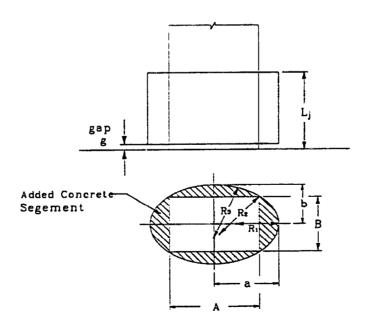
Confinement of Rectangular Column Base with Oval Carbon Jacket and Added Concrete Segments
